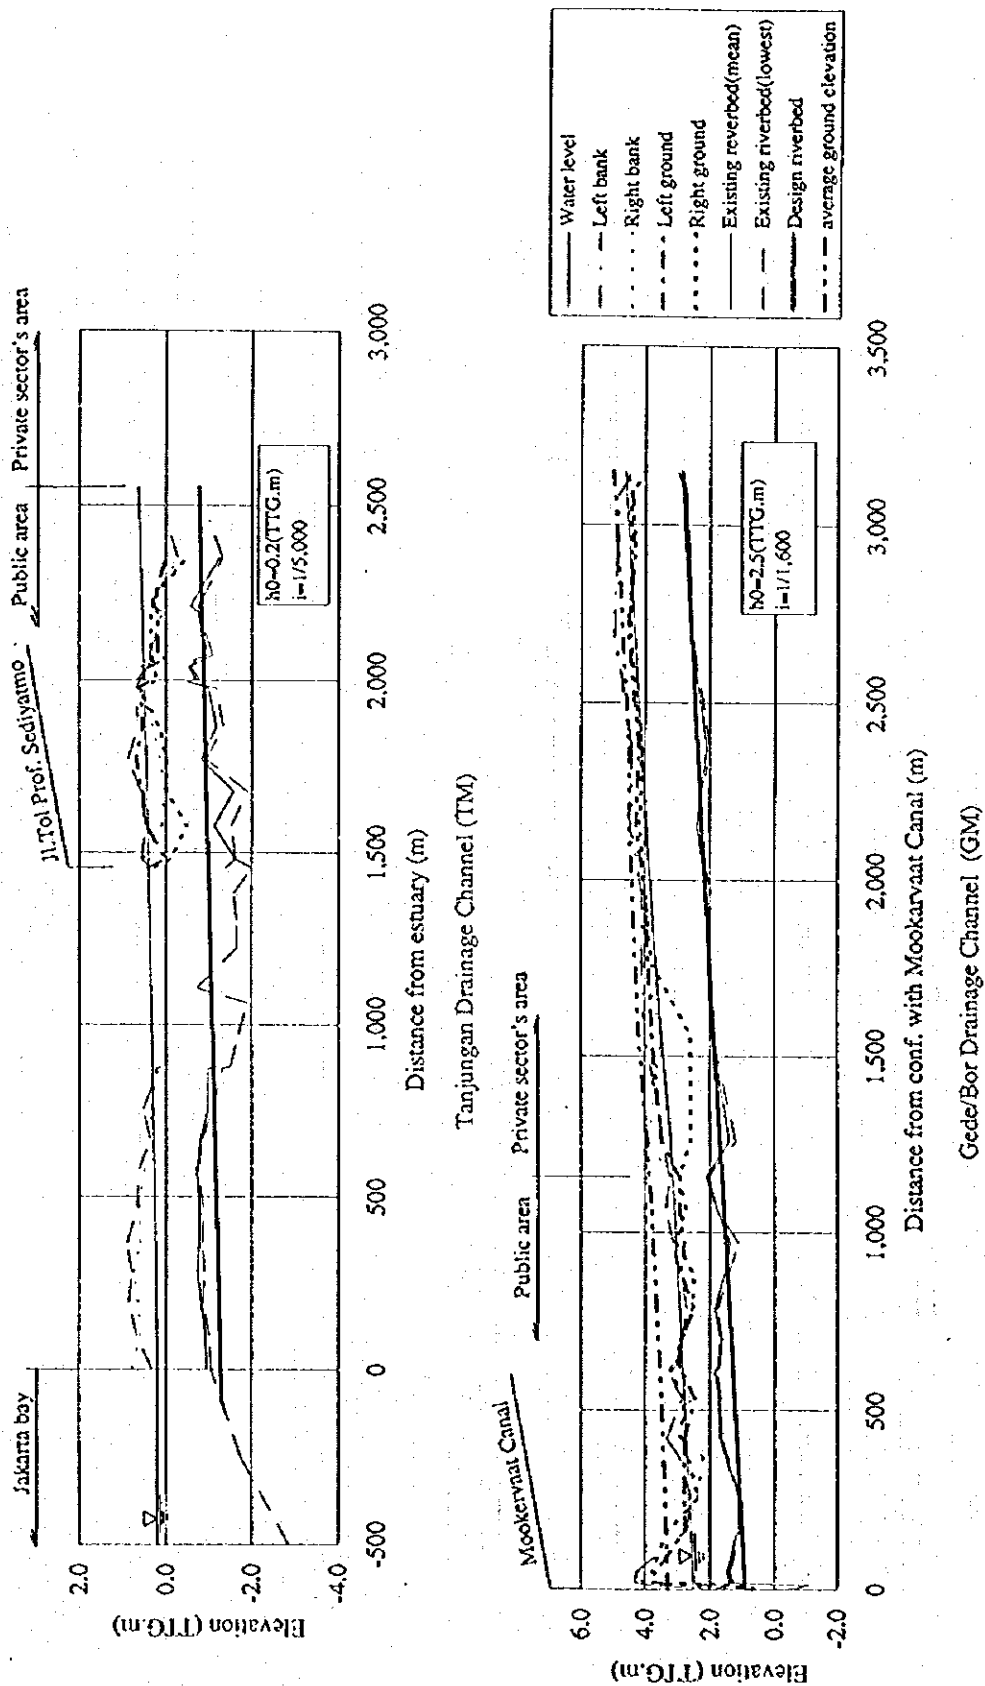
Longitudinal Profile of Proposed Drainage Channel(2/4)
